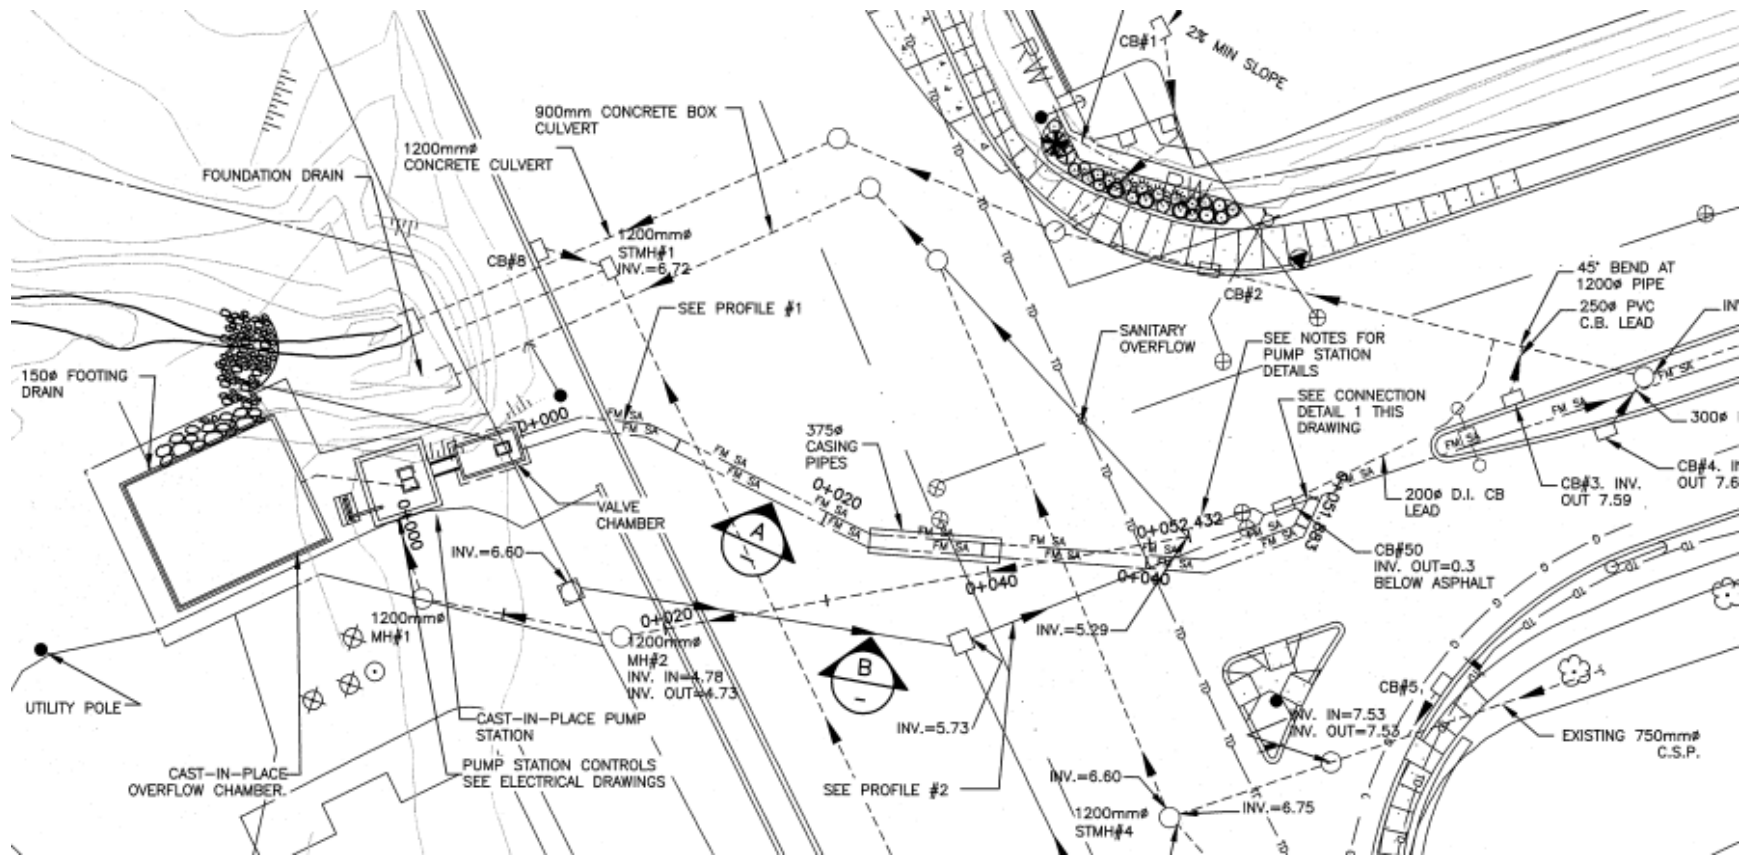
Akerley Boulevard physical layout – plan view of upgraded forcemain.
